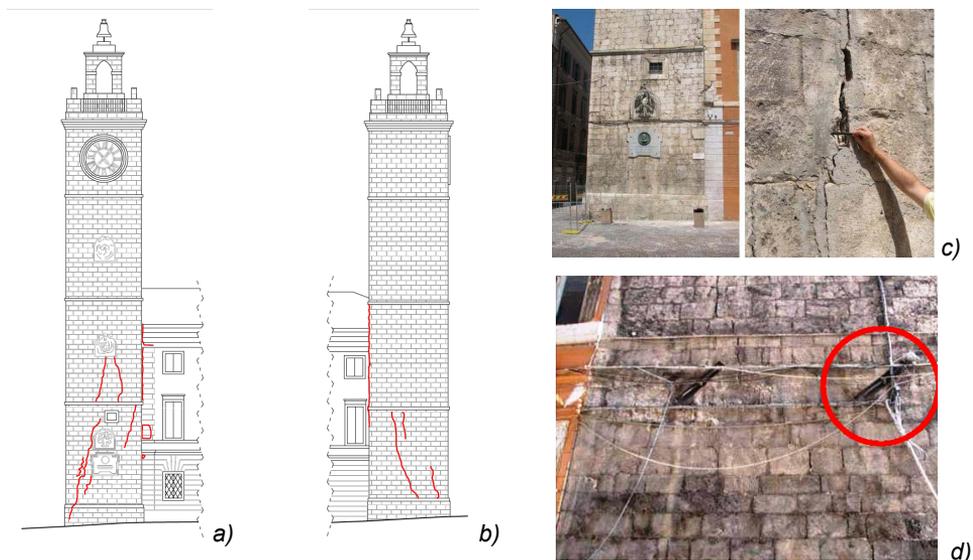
Crack pattern survey after the earthquake on the East (a) and South (b) elevations. c) Sub-vertical cracks at the tower's basement. d) Break of the anchor plate of a metal tie (Buffarini et al. 2009).
